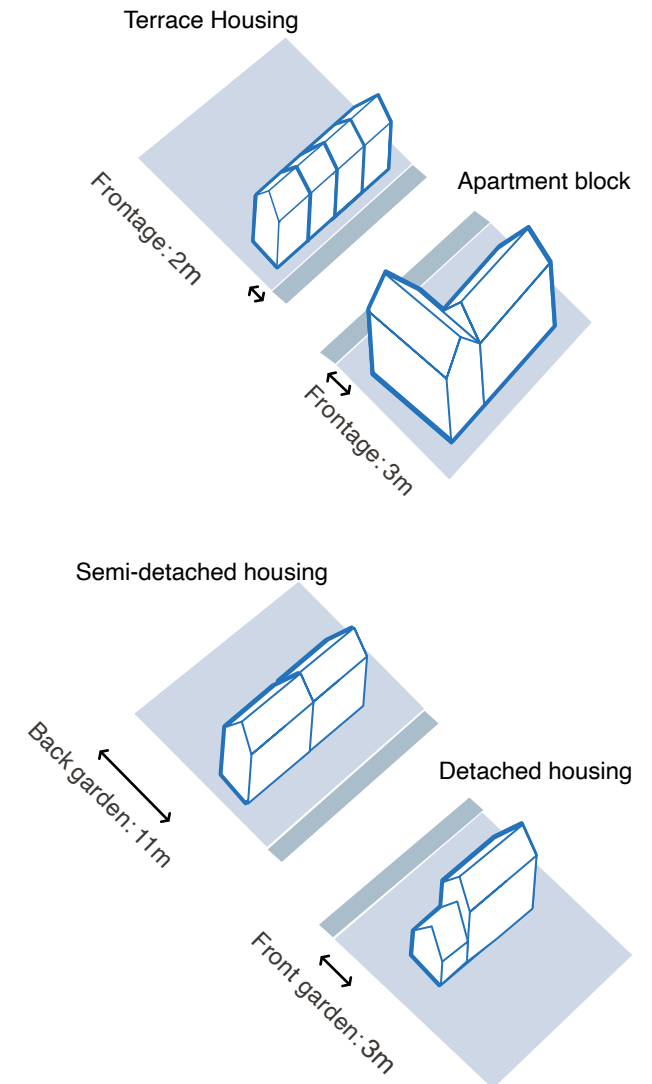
Illustrates minimum depths of frontages in new buildings and back gardens
